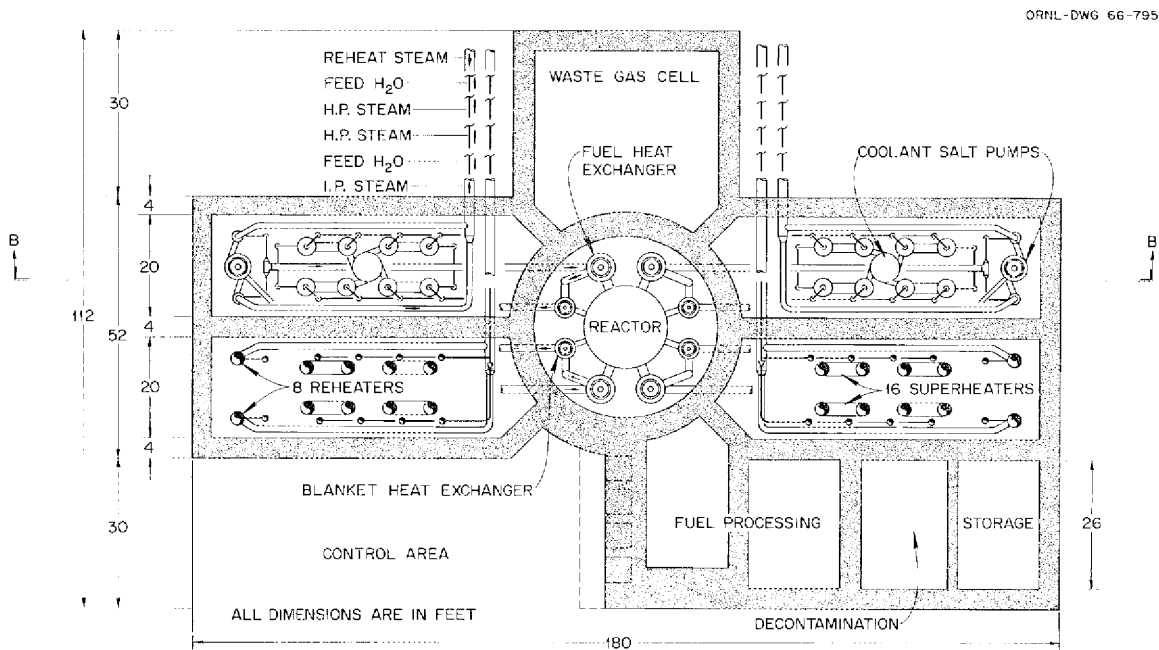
Plan View of MSBR Cell Arrangement.
